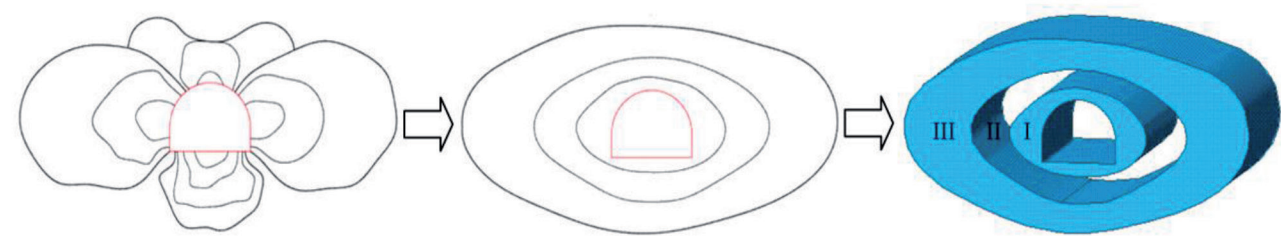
Unloading zones of the surrounding rock of the tunnel
